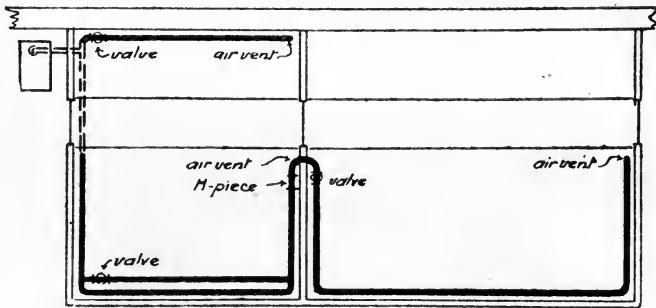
Plan of piping system in two adjacent glass-houses.
